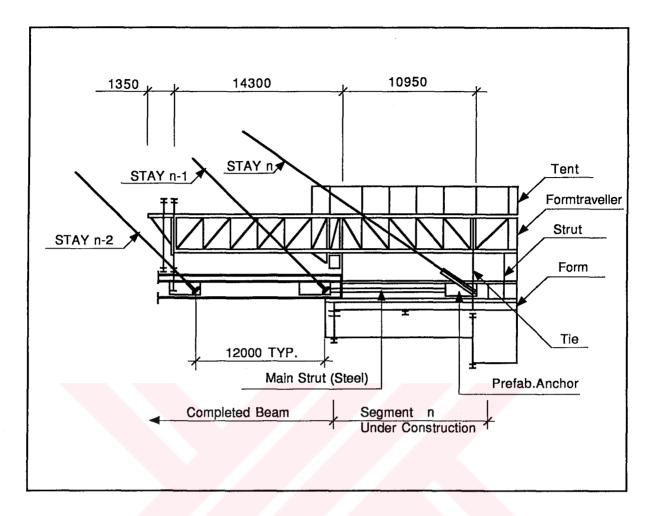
CONSTRUCTION METHOD (In mm)
